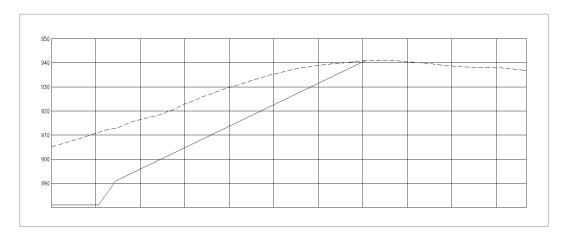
Longitudinal Section 01 at tunnel inlet embankment and initial excavation design
